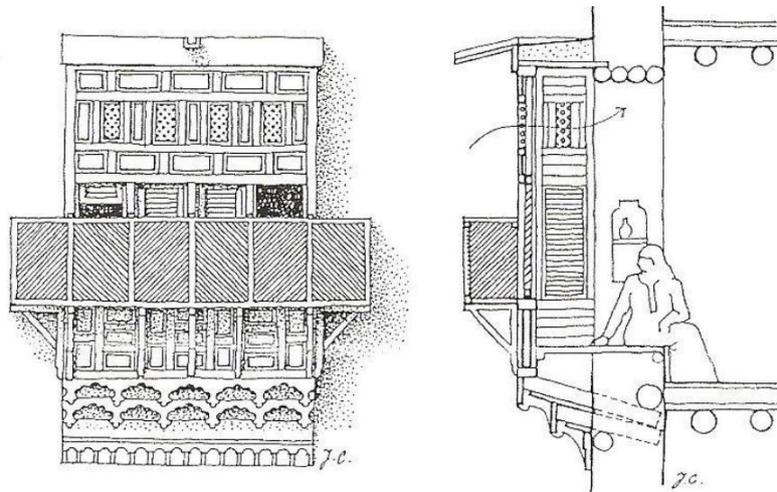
Details of Mashrabiya in elevation and section view (Ragette 2006)
